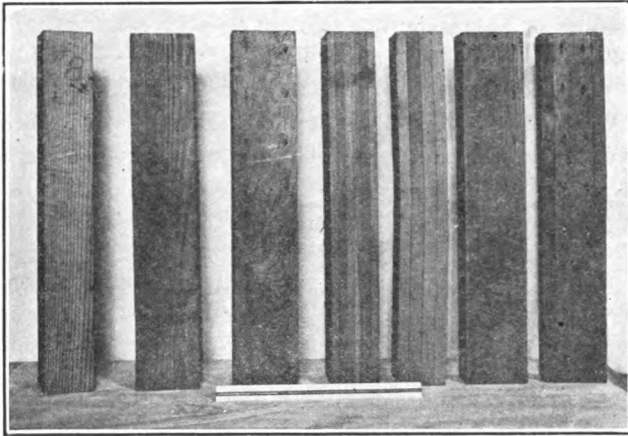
TEST-COLUMNS AFTER FAILURE.
